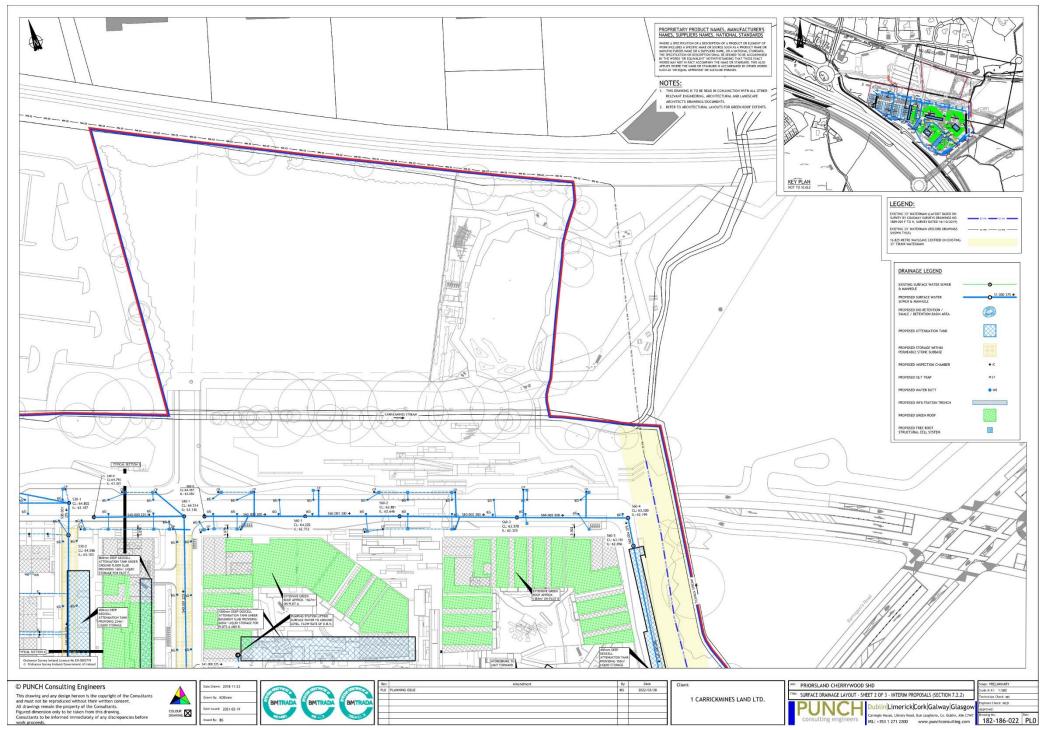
Surface water drainage – Interim Proposal (sheet 2)
